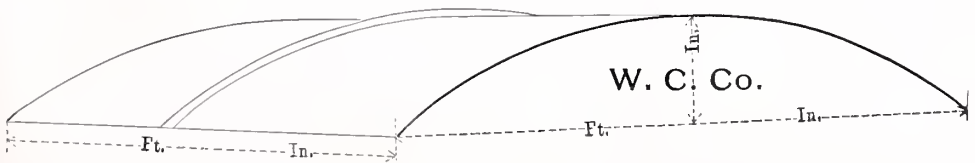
Shows application of Curved Sheets in Fire Proof Buildings between Floor Beams.
